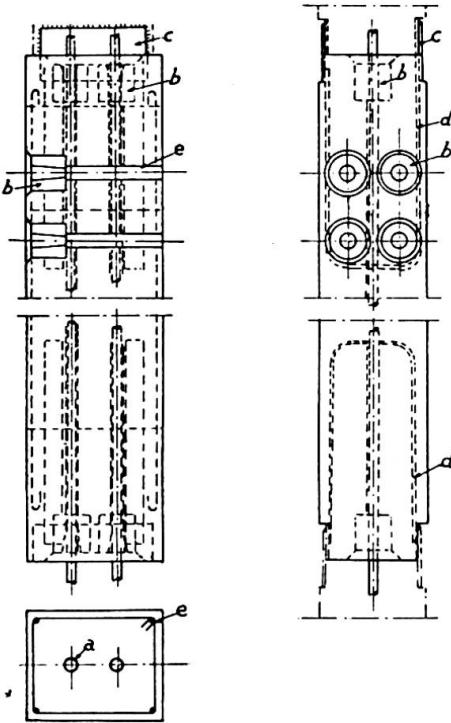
(left). Detail «A» of figure 6 (plan and side elevation).
